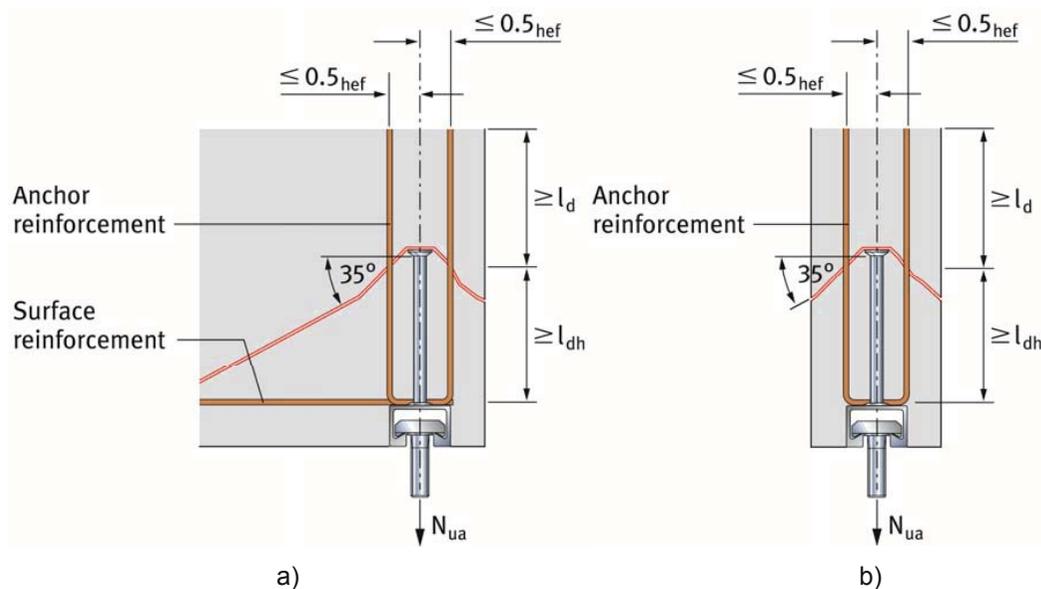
Arrangement of anchor reinforcement for anchor channels loaded by tension load
